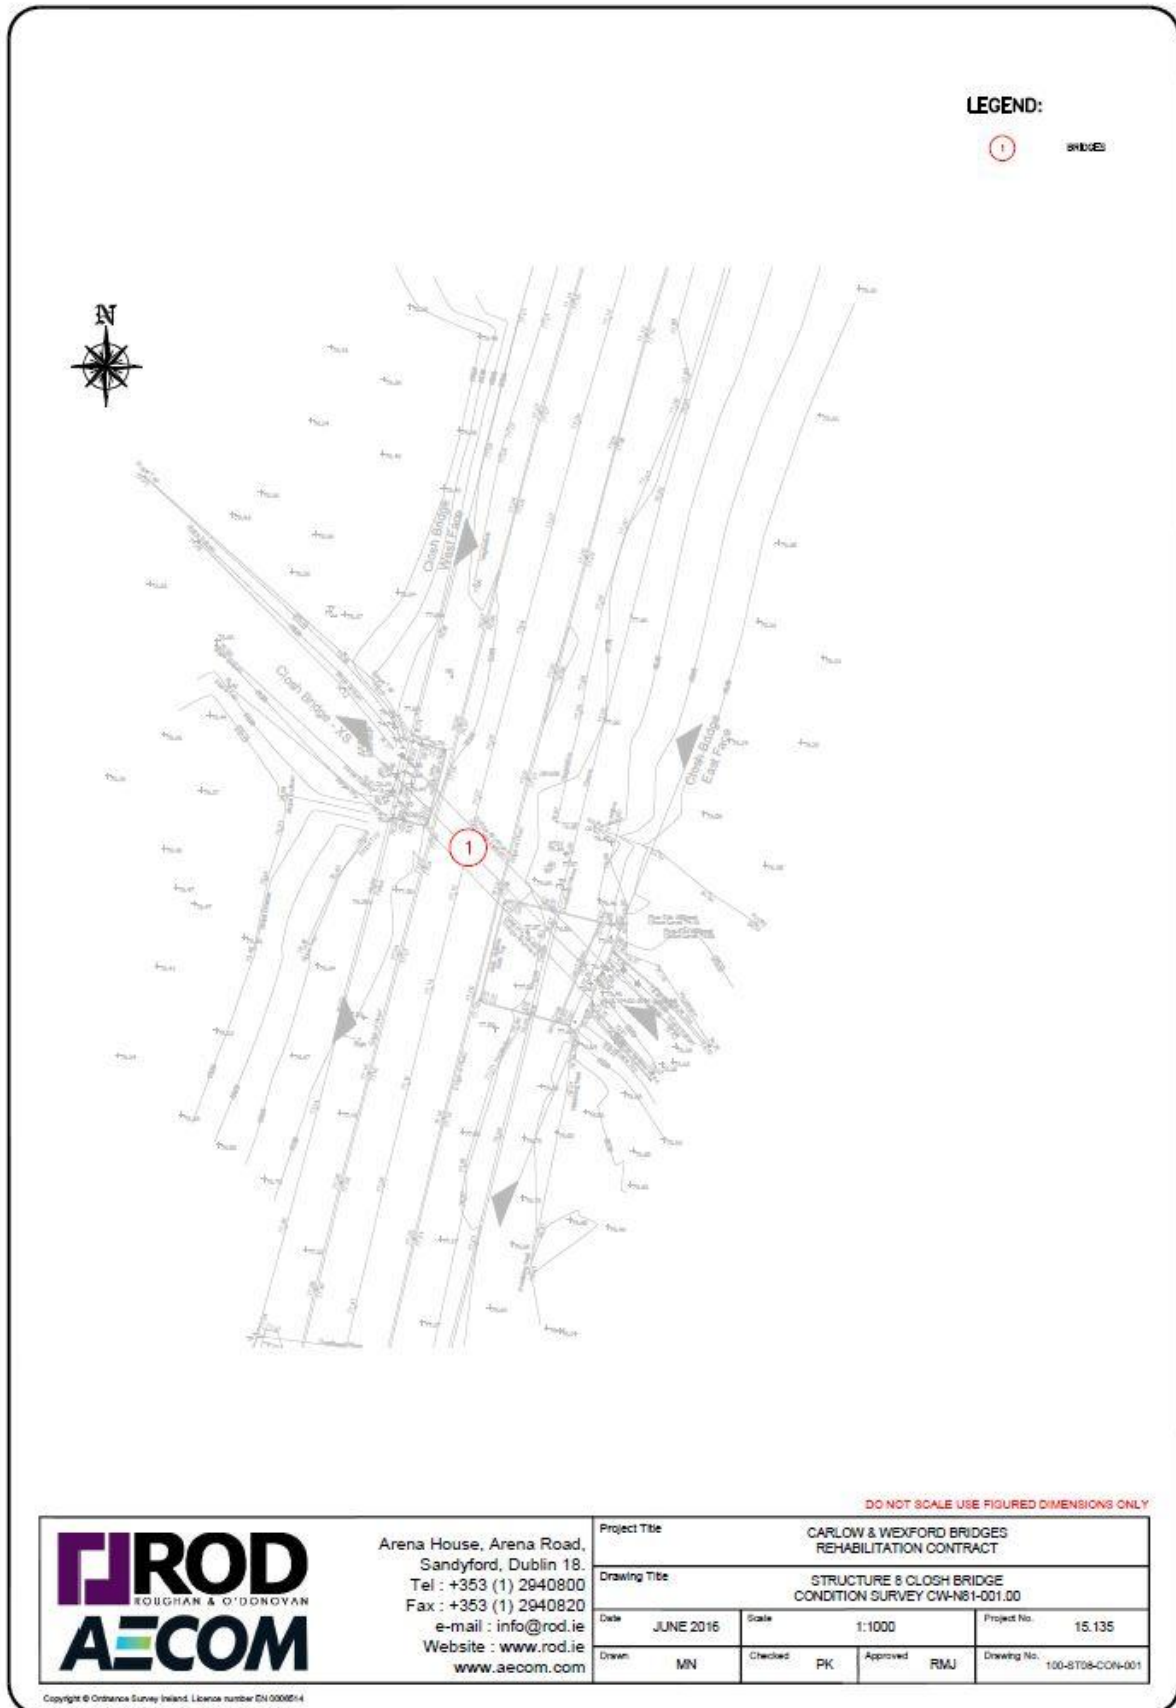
/73/8 Str08 Closh Bridge CW-N81-001.00
